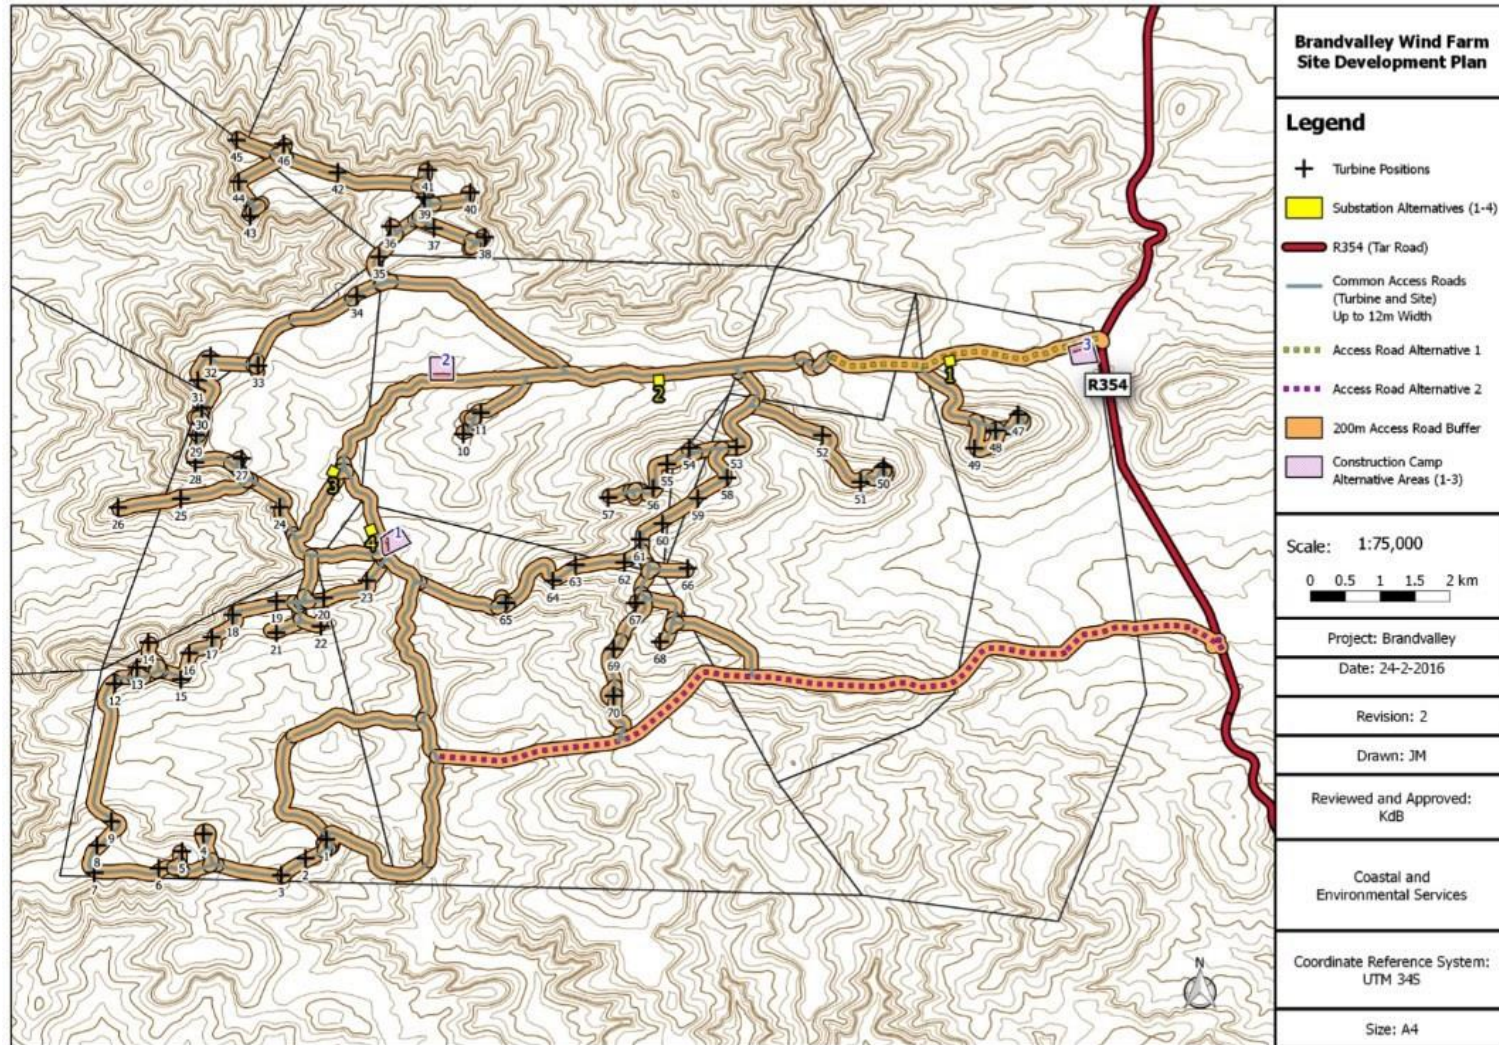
Map of the site development plan for the proposed Brandvalley WEF showing alternative access roads as well as sites for construction camps and substations.
